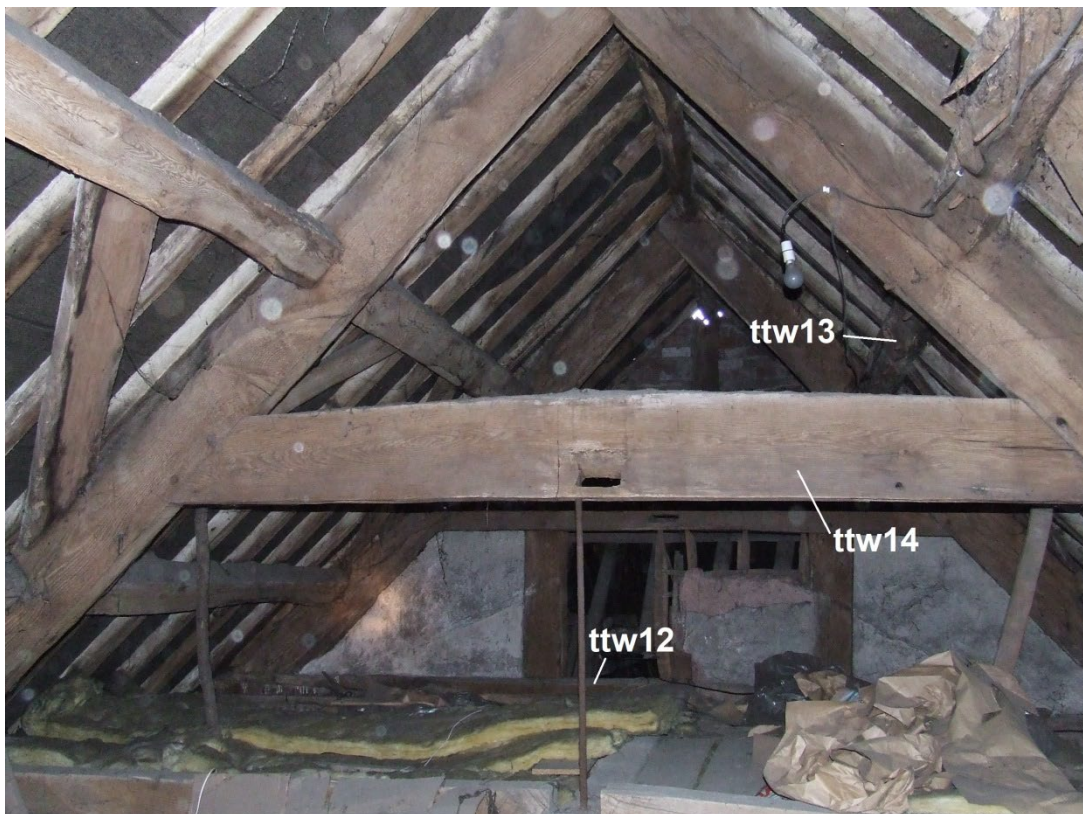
View of truss 9 (foreground) and truss 8 (rear) showing timbers sampled for dendrochronology (photograph Martin Bridge)
